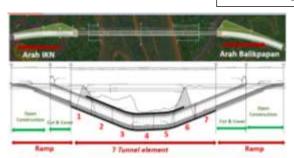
Plan View and Longitudinal Section of Sepaku Immersed Tunnel
